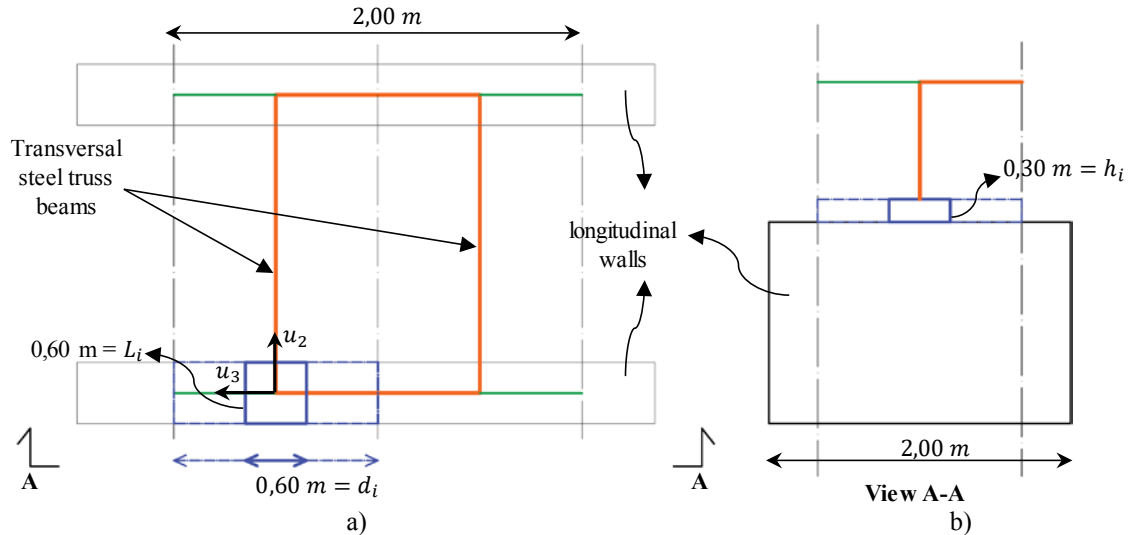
Steel truss deck *Module* adopted for the restoration design of the “Galleria delle volte crollate”: a) plan and b) lateral view. Note that the frictional bearing is here represented by the equivalent prism.
